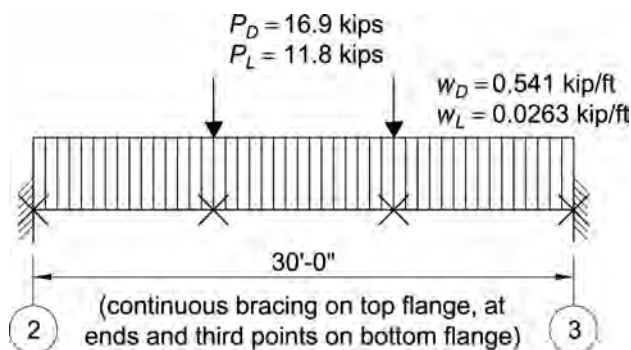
Loading and bracing diagram for typical east-west edge girders.
